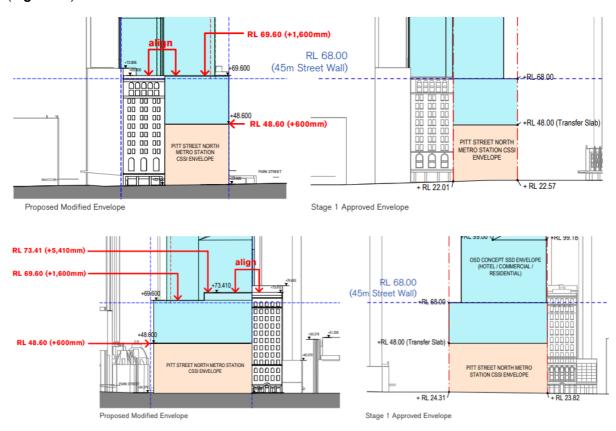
| Building envelope modifications - Pitt Street elevation (top) and Castlereagh Street elevation (bottom) (Source: EIS)
